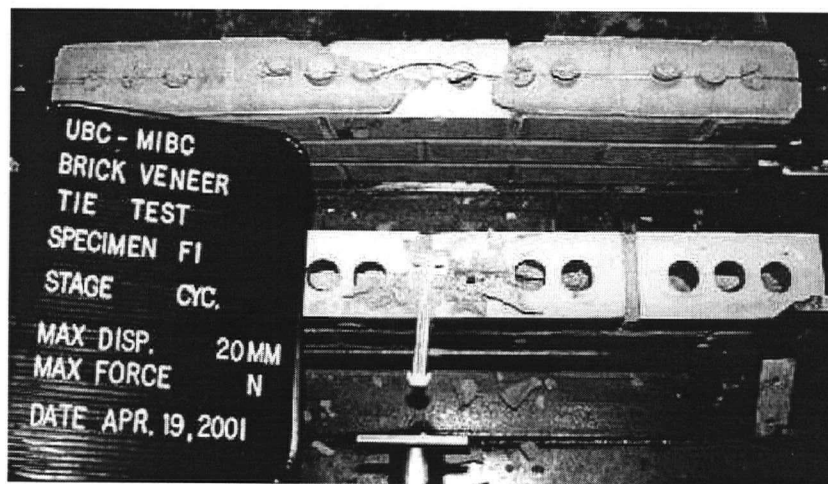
Photograph of a failed specimen with a Fleming anchor type of tie with horizontal wire bed joint reinforcement.
